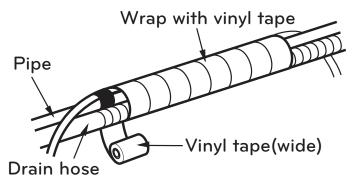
Wrapping Connection Pipe to Indoor Unit's Pipe
